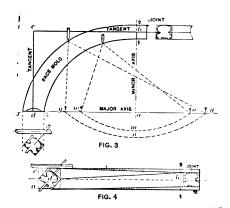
Method of Laying Out Face Mold by Means of String and Pins.
